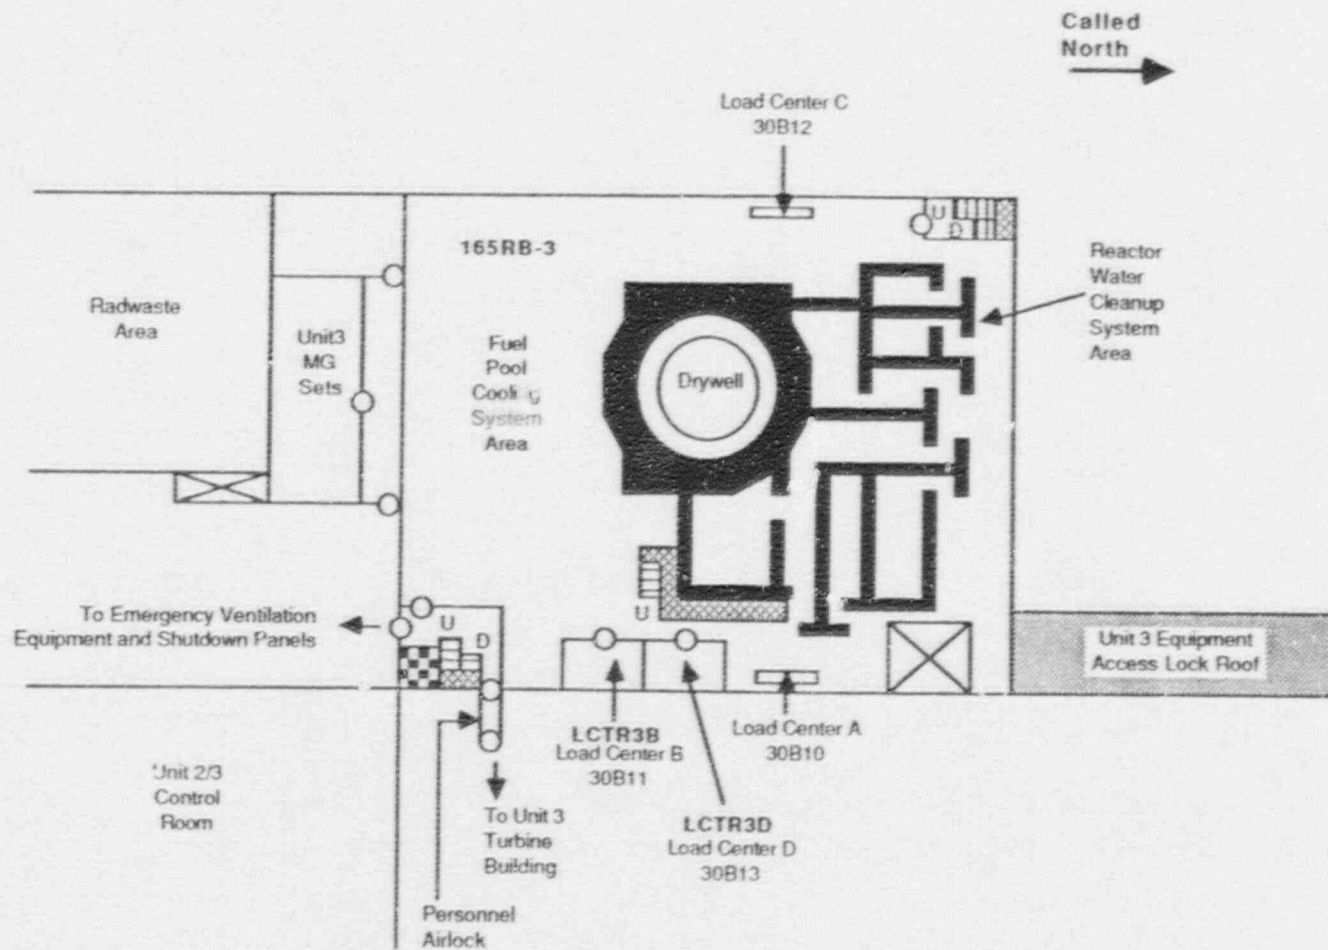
Peach Bottom 3 Reactor and Radwaste Building and Unit 2/3 Switchgear Rooms, Elevation 165'0"
